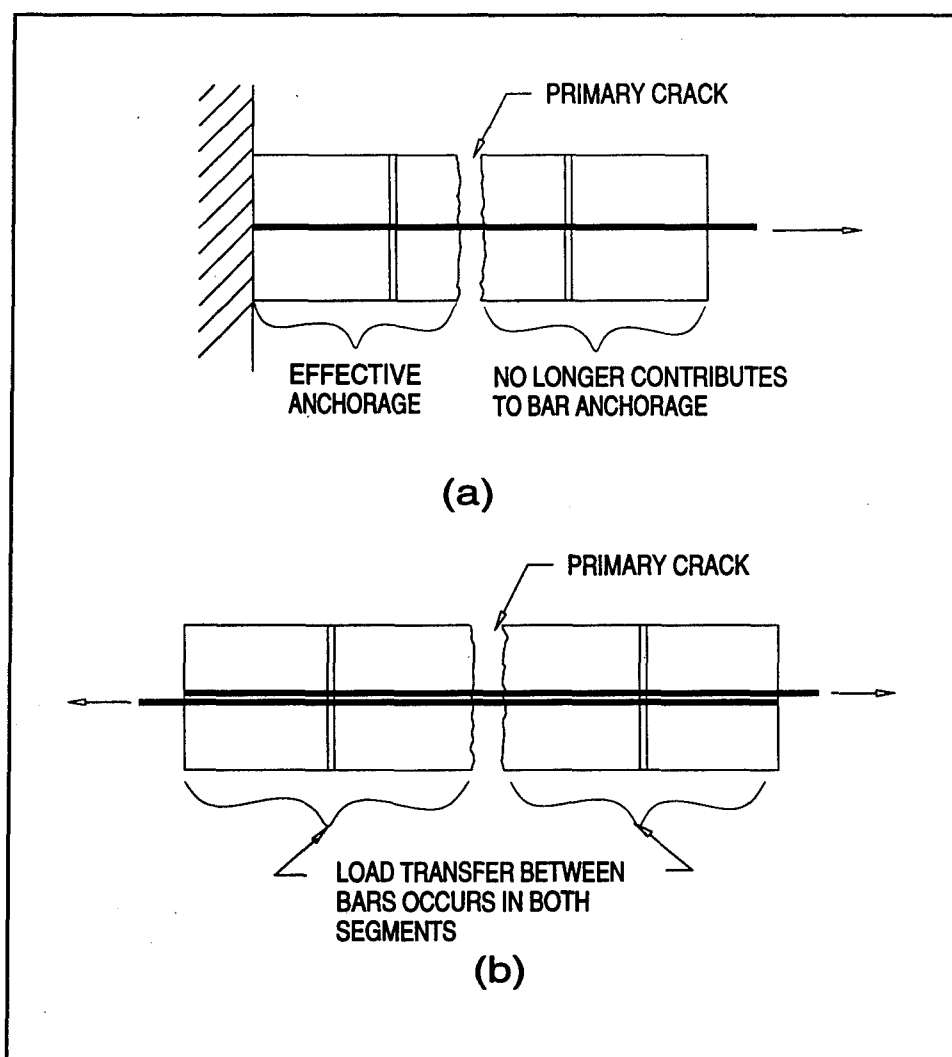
Effect of primary crack on stress transfer in (a) single-bar anchorage; (b) lap splice
